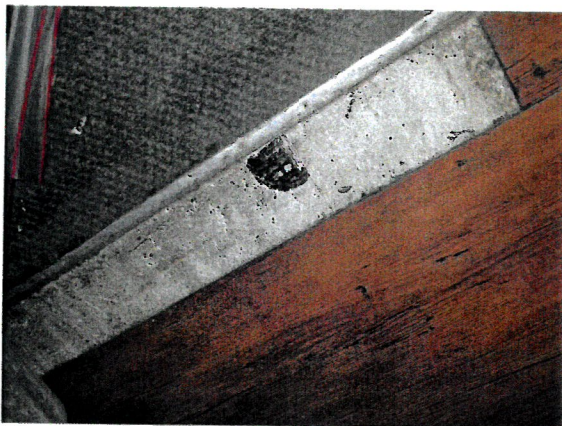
Vinyl Floor Tile – Banquet Hall Below Laminate (ND)
